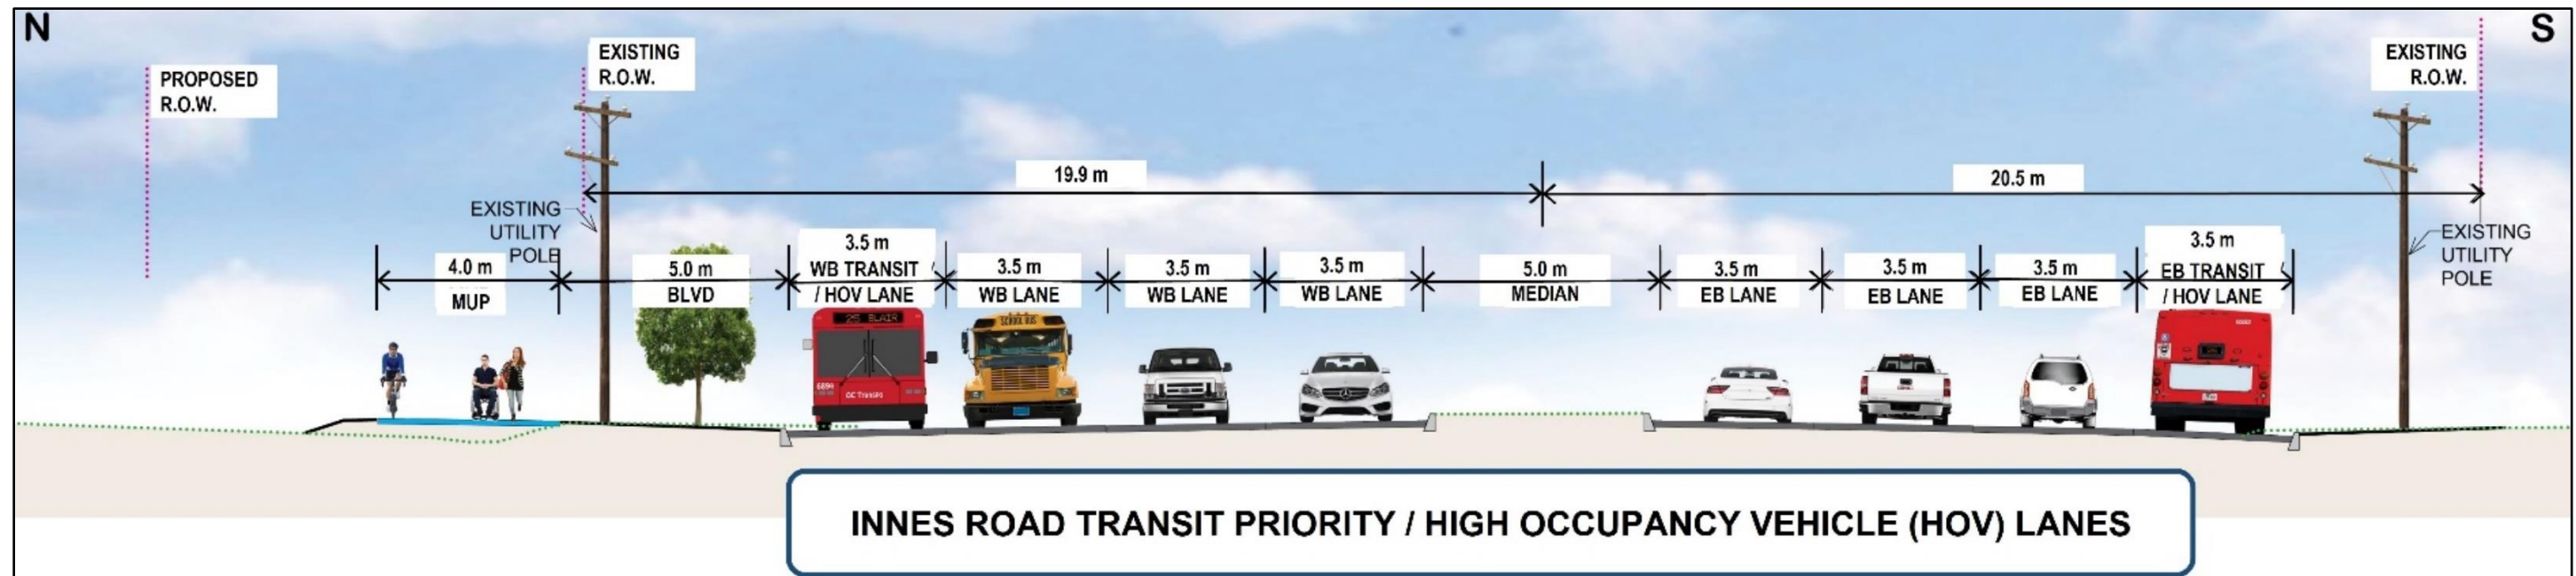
Recommended Plan Typical Cross-Section along Innes Road
